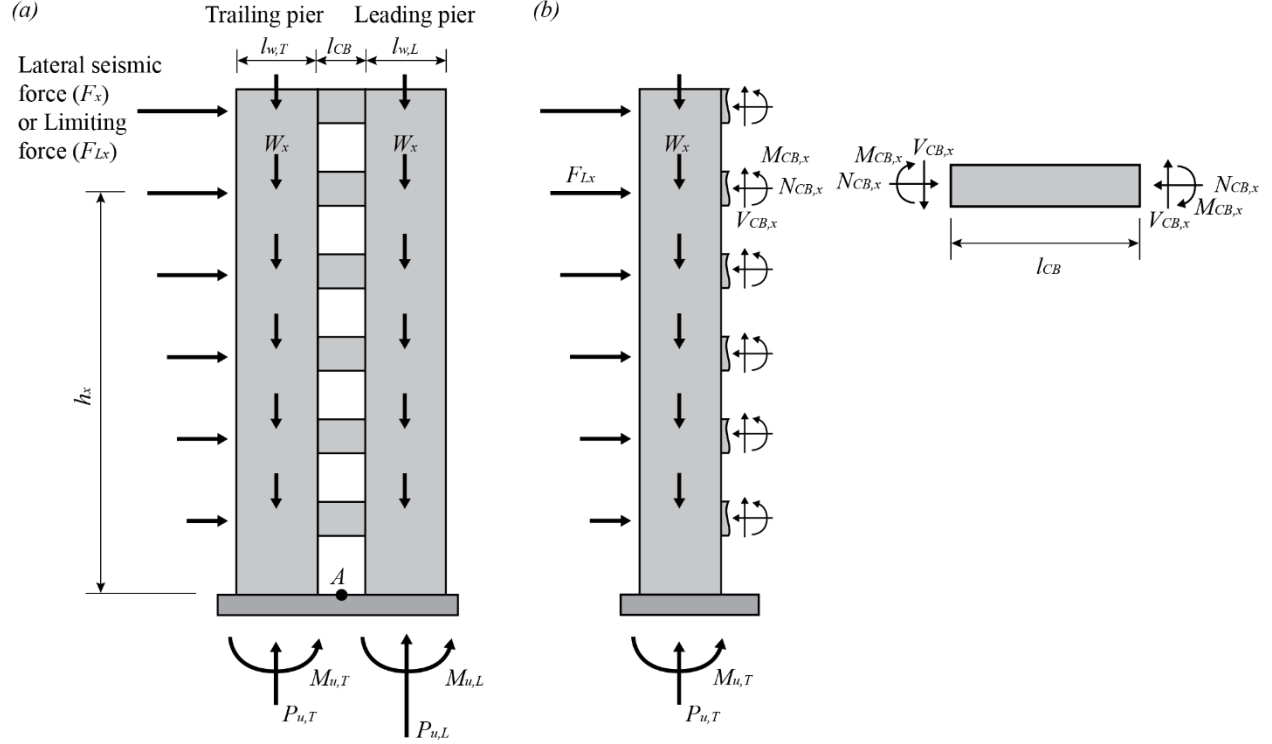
(a) Free body diagram of the coupled walls and (b) free body diagram of the trailing wall and coupling beam at floor x
